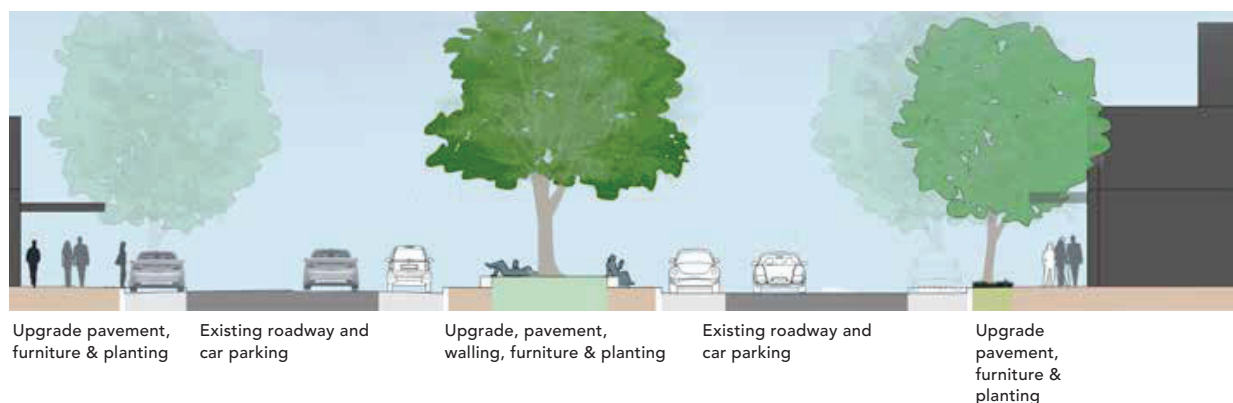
Belle Vue Avenue Indicative Streetscape Section
